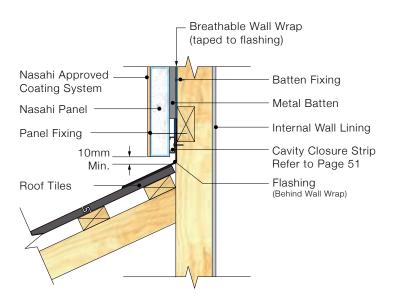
Eave Detail (Panel Flush With Lining)
